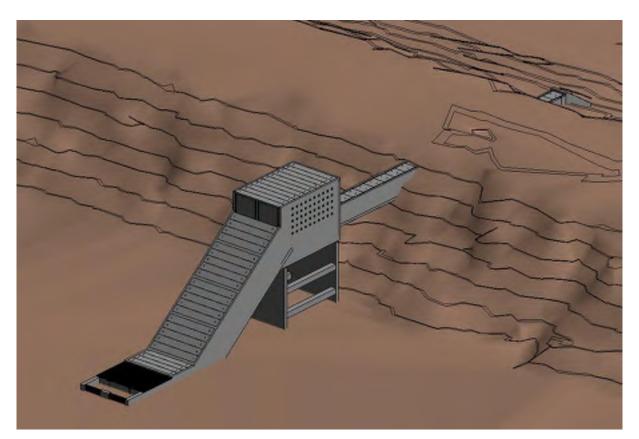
Isometric View of Proposed Screw Pump Station Including Outlet Channel
